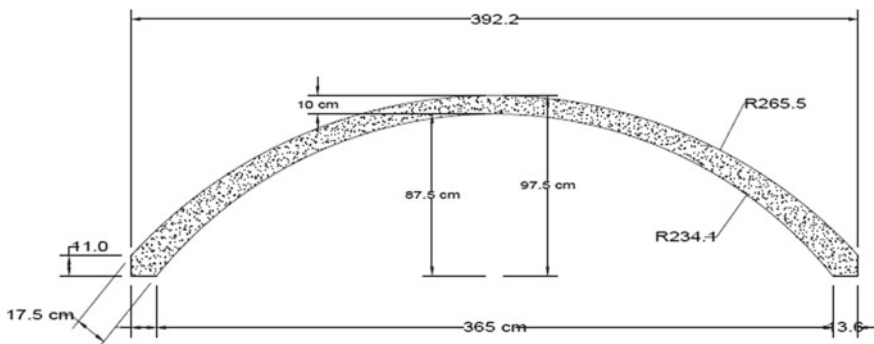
Dimensions of the constructed arches (all dimensions are in cm)
